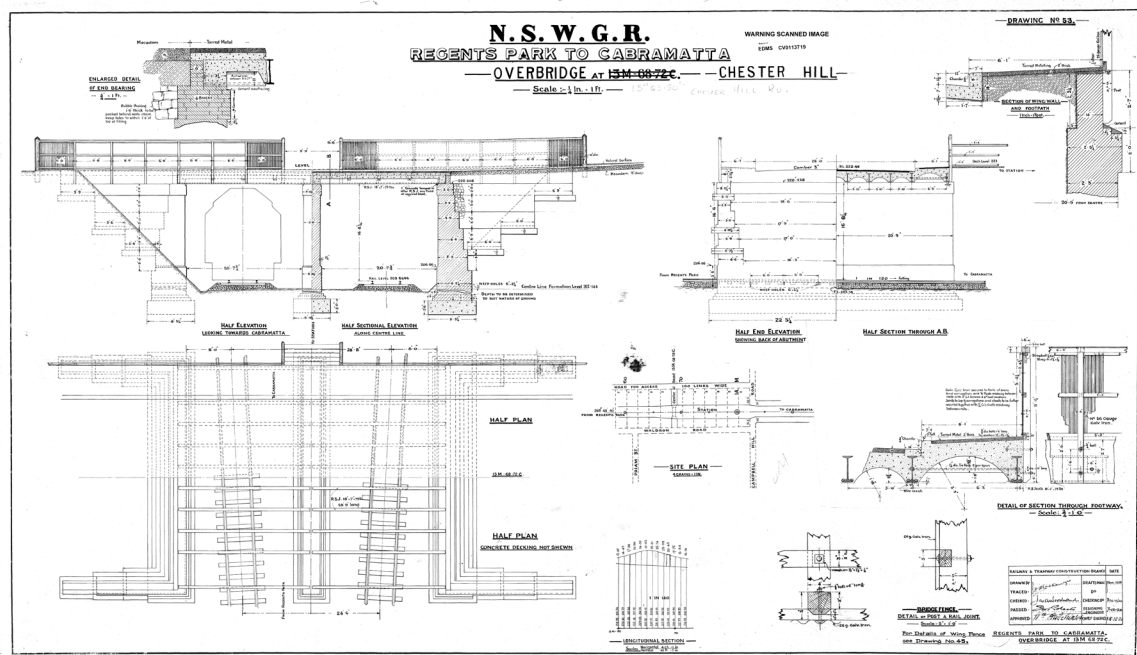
NSWGR Regents Park to Cabramatta – overbridge at Chester Hill Railway Station, c.1922 (Virtual Plan Room).
